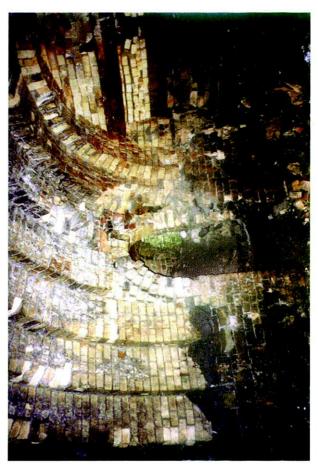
No.2 Furnace - a typical 'stepped' vault.
